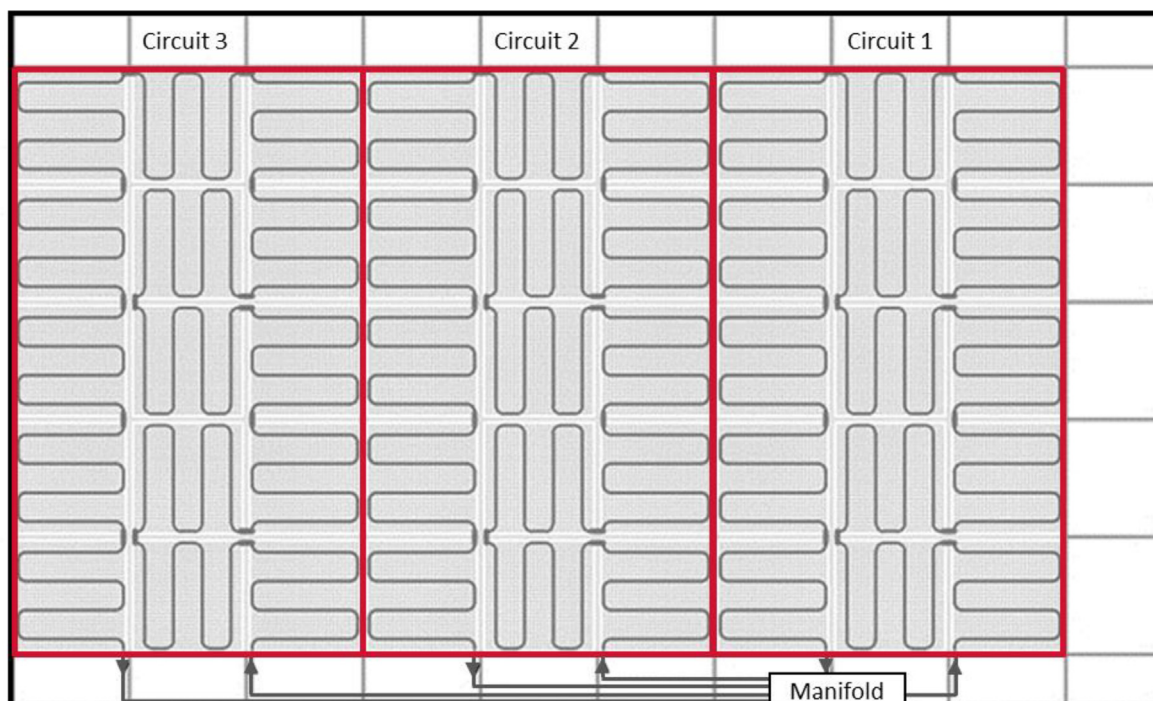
The layout of ceiling tiles and connection to the manifold.
